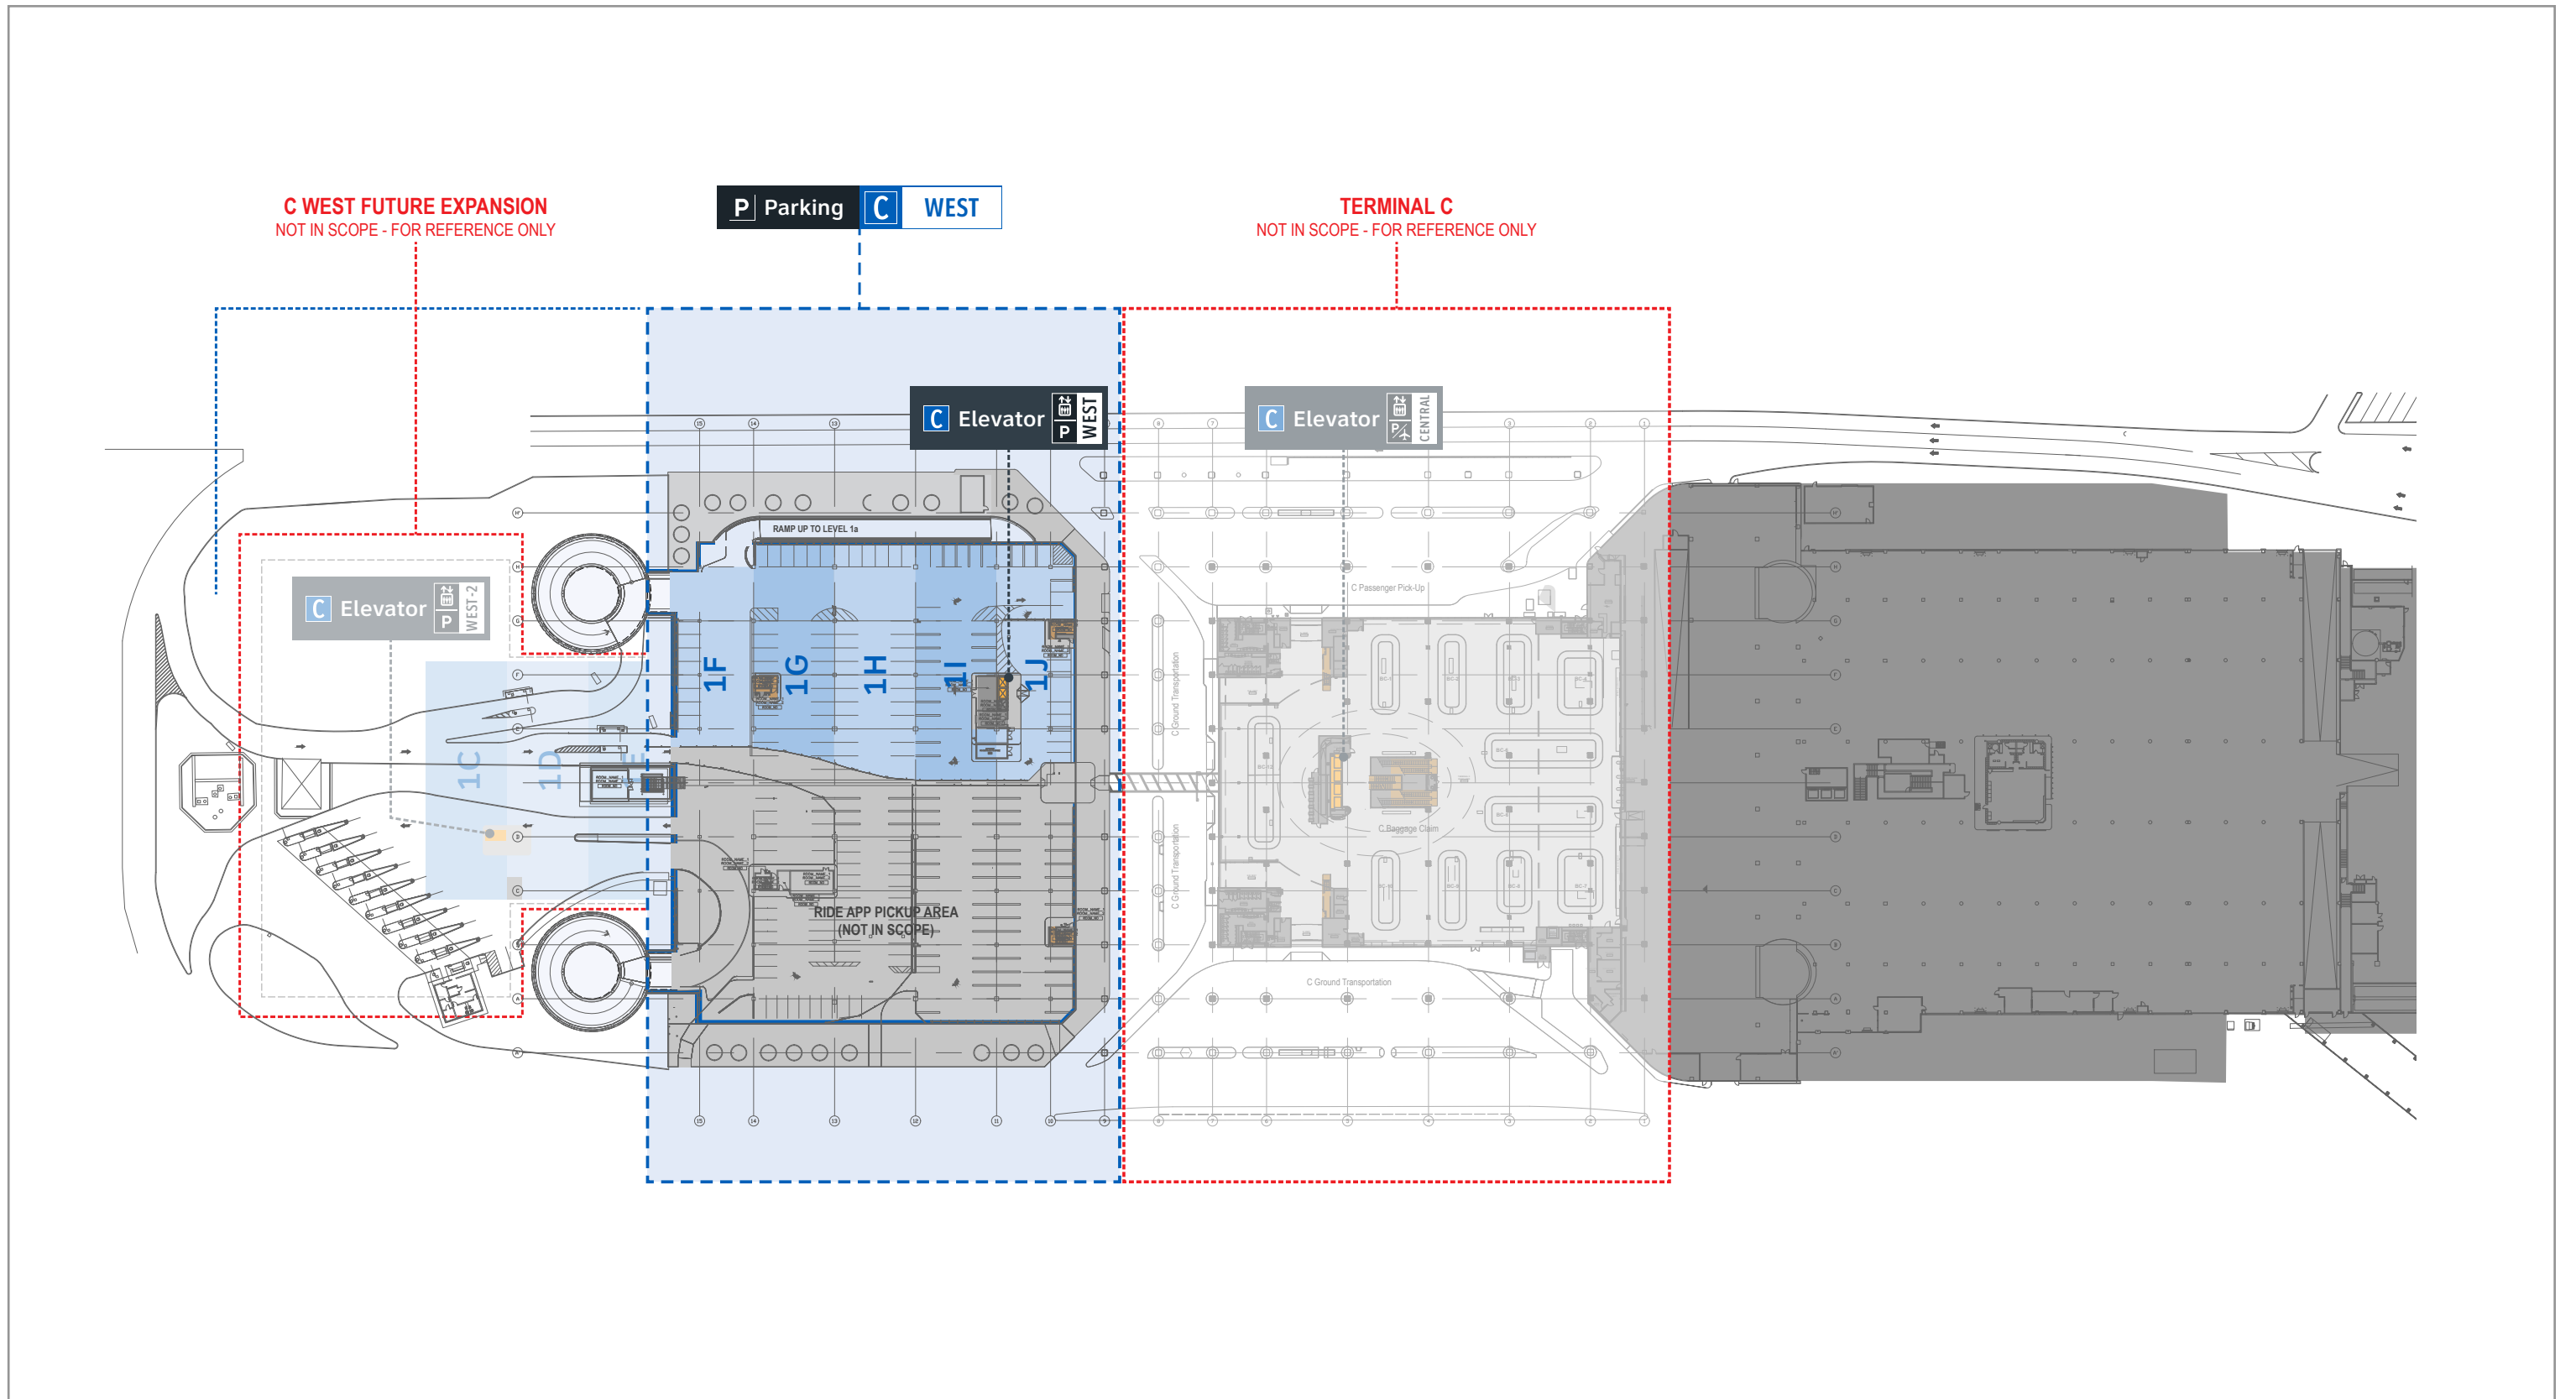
Parking C & D/E: New Terminology Plan - Level 1
